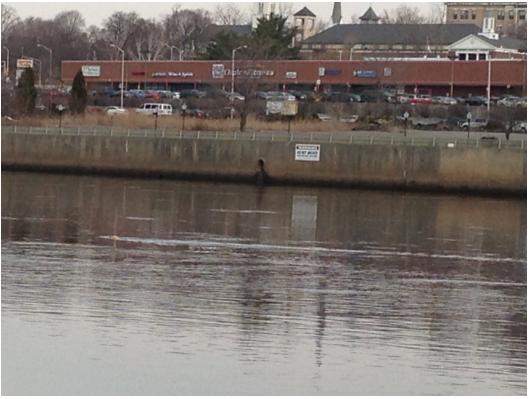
4/8/13 8:35 am View facing North of stormwater outfall MR 1164 from Crescent Yacht Club.
